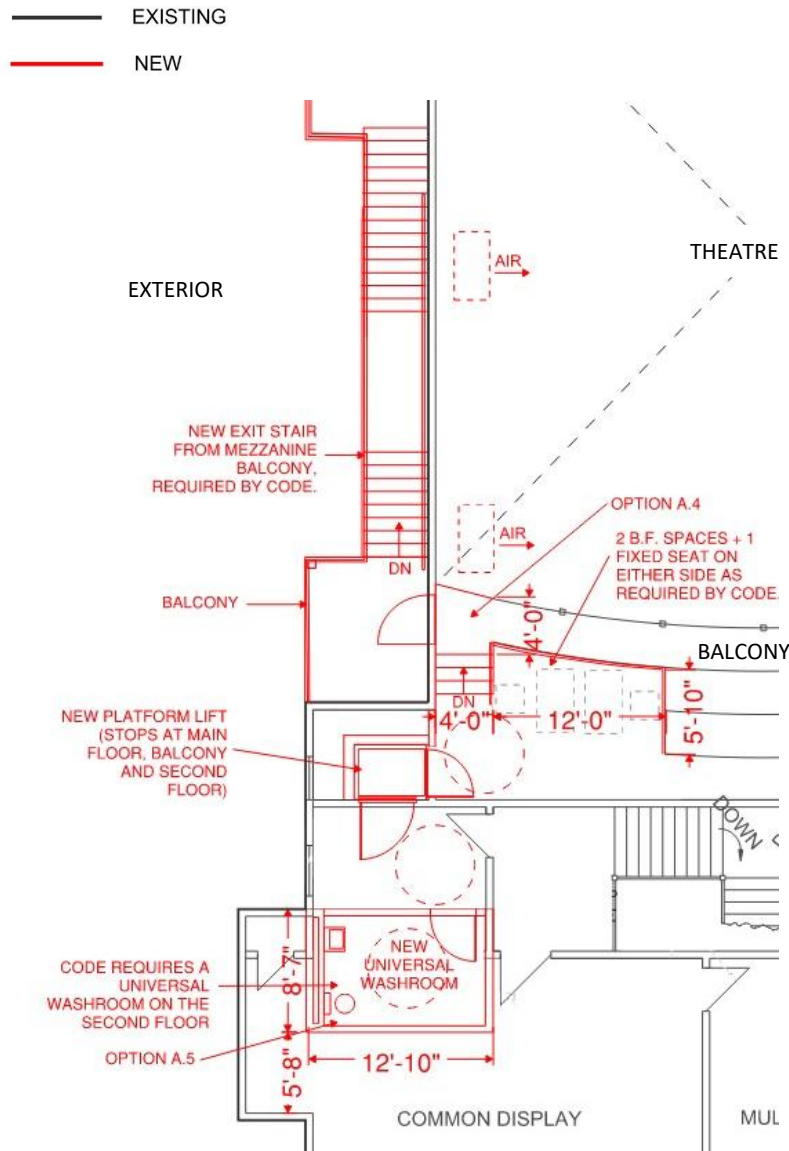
Option A.4: Platform lift installed in existing stair shaft
